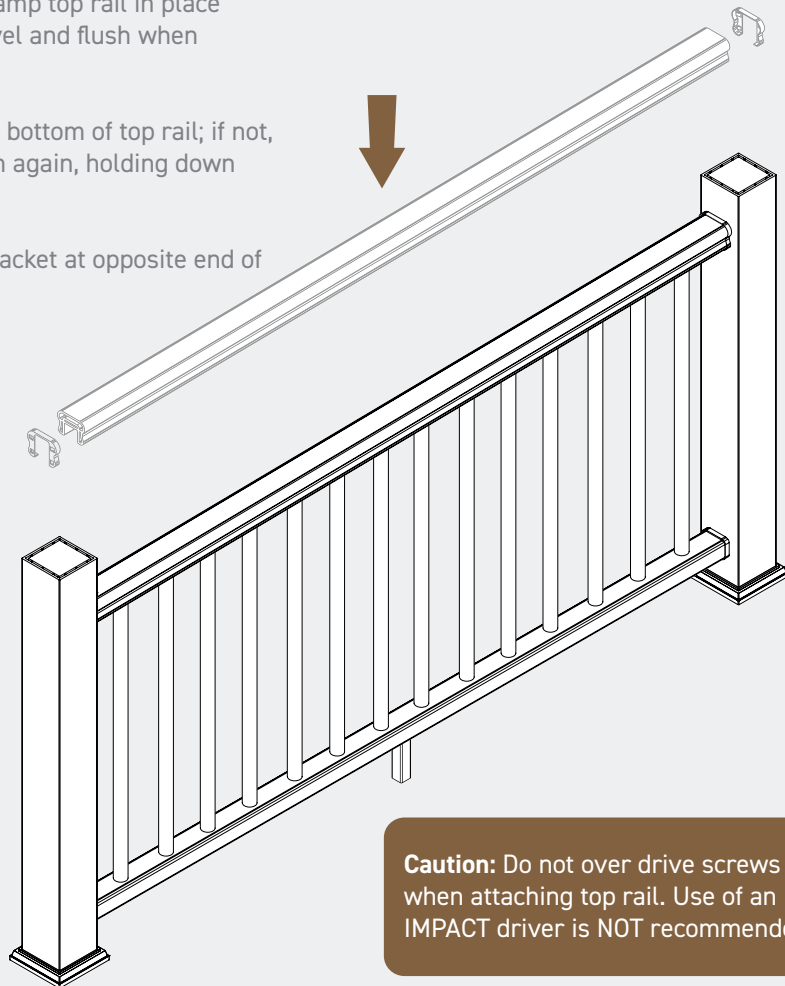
Drive two #10 screws through angled holes in bracket
